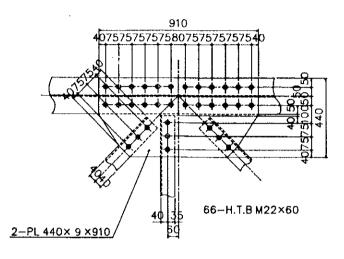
DETAIL OF MAIN TRUSS AND FLOOR BEAM SCALE 1:10
